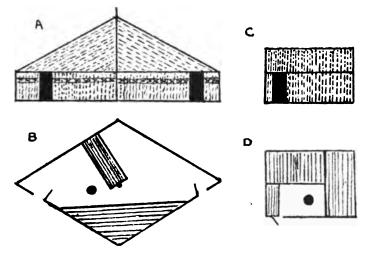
Elevation and ground plan of two modern Miriam houses, by A. W. Scale 16 ft. to 1 in.
